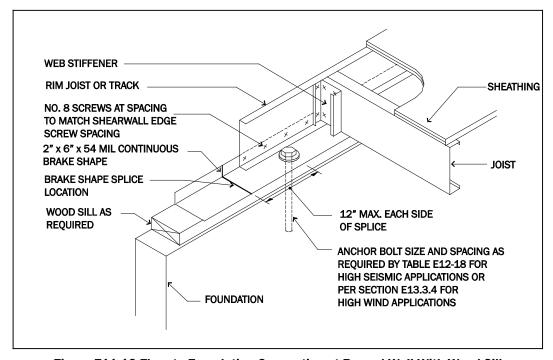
Floor to Foundation Connection at Braced Wall With Wood Sill
